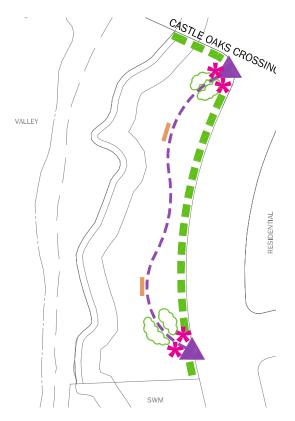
Park #6 Concept Plan (1.0 ac)
